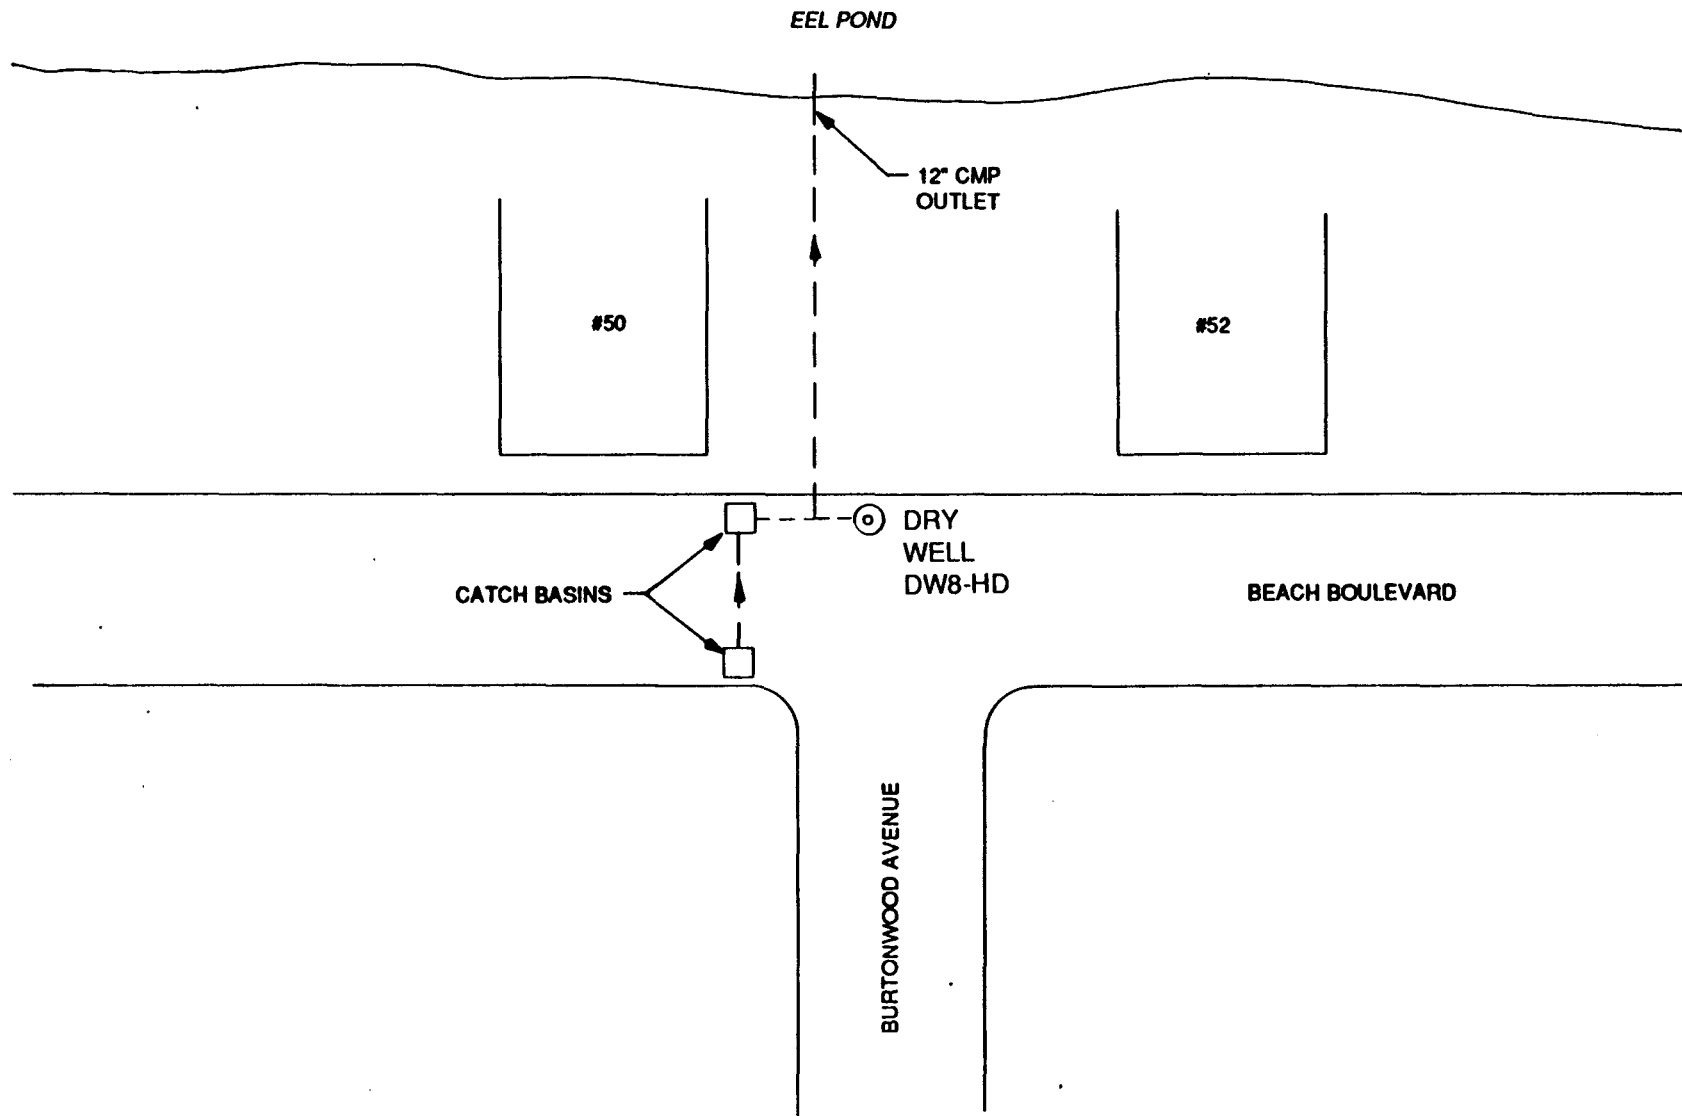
BEACH BOULEVARD/BURTONWOOD AVENUE RECOMMENDED DRAINAGE MODIFICATIONS
